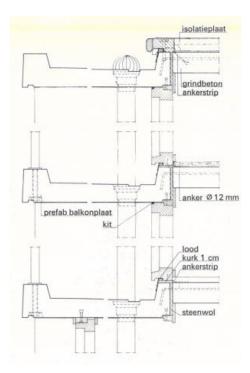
Facade section of the RBM system (Priemus & Elk, 1971)
